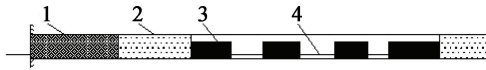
Design drawing of upper bench blast holes (Unit: cm)
